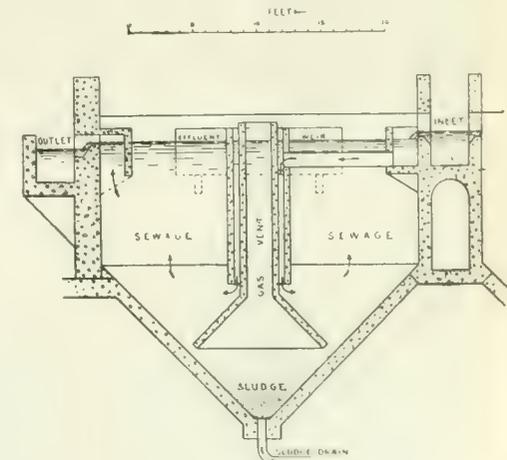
Sectional Elevation of Proposed Dortmund Settling Tank of Type Recommended for Use on New York Artificial Sewage Disposal Island.
